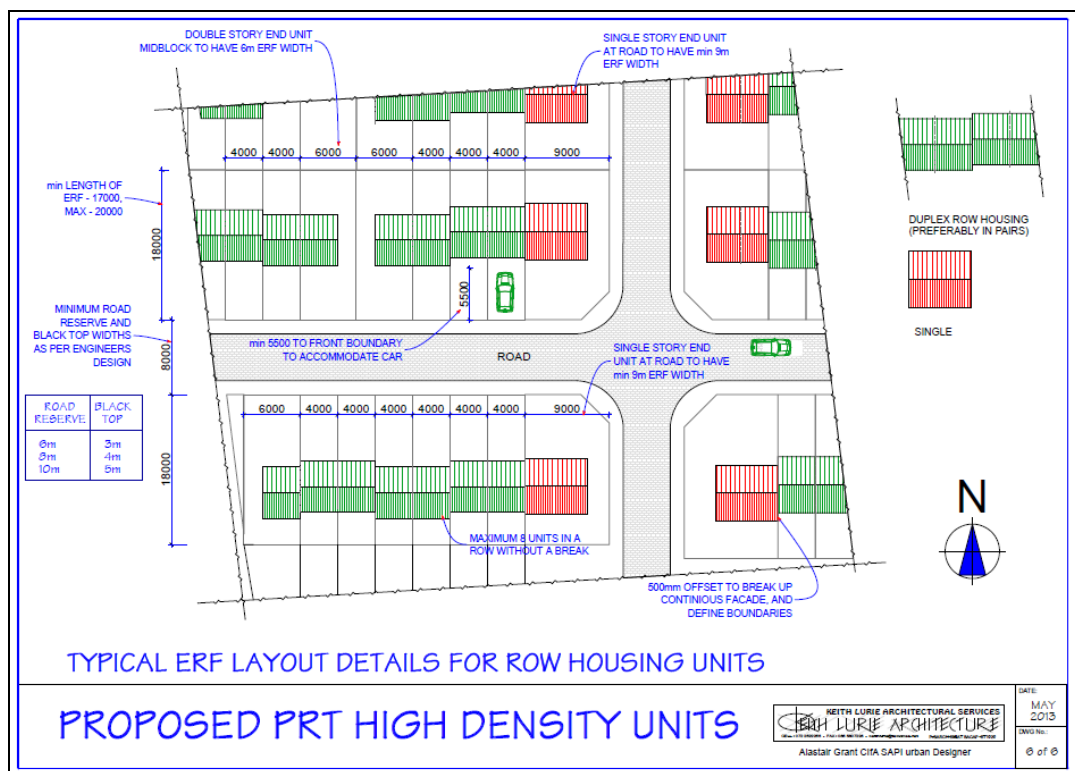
Typical erf layout details for high density row housing proposed (source: Keith Lurie Architecture)
